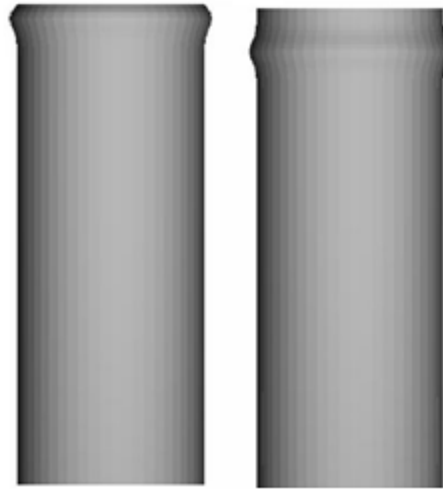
3D Extruded View of the Steel Jacketing of Column
